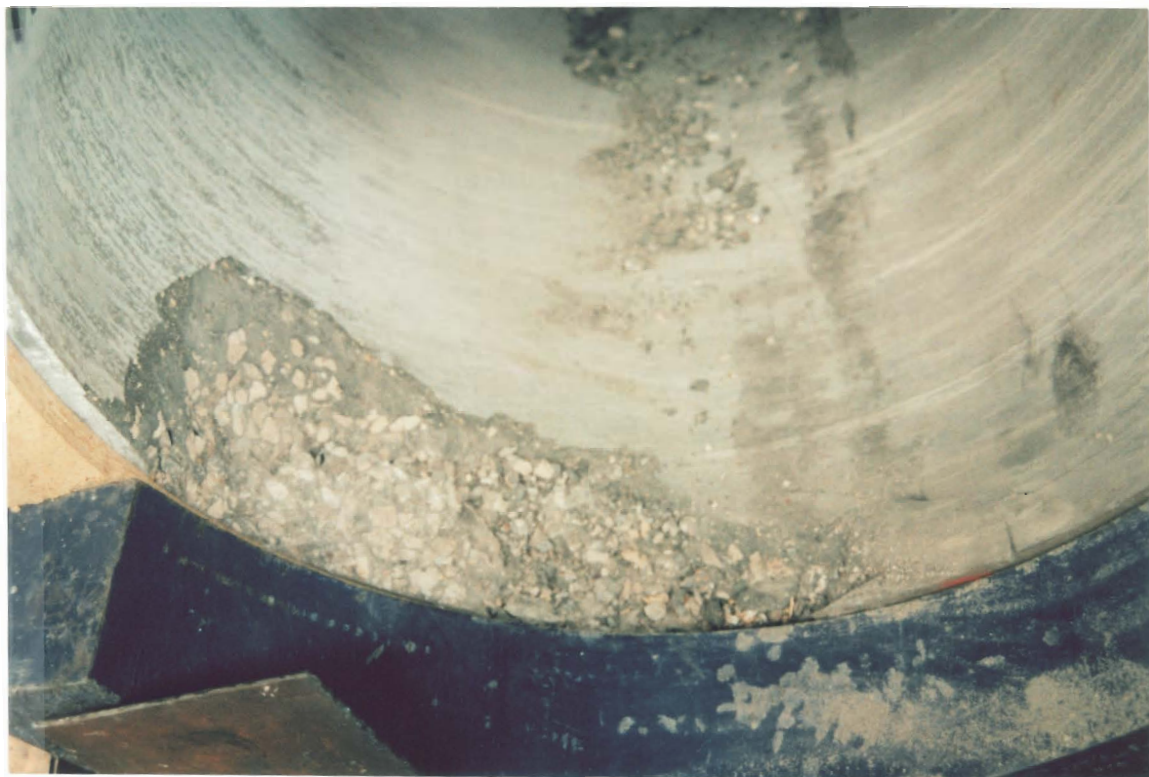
Pipe 9: Standard pipe with joint reinforcement (1.0° deflection)
